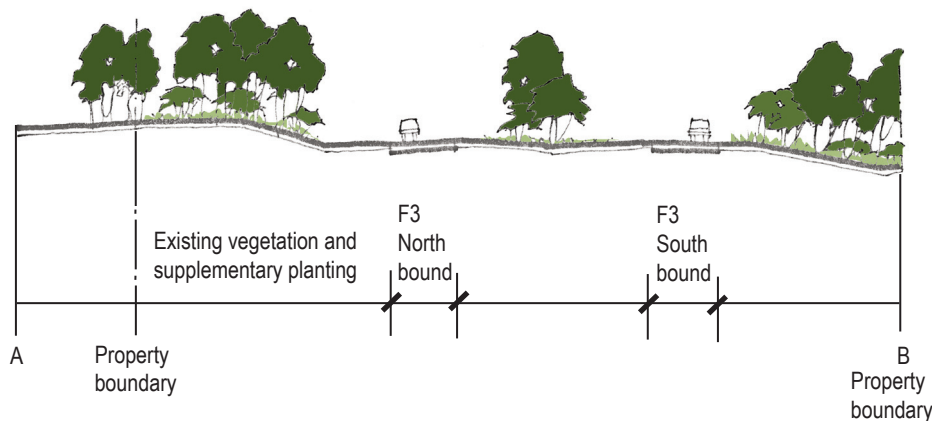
SECTION 8: Landscape setback along Sparks Road and southern portion of Hue Hue Road
